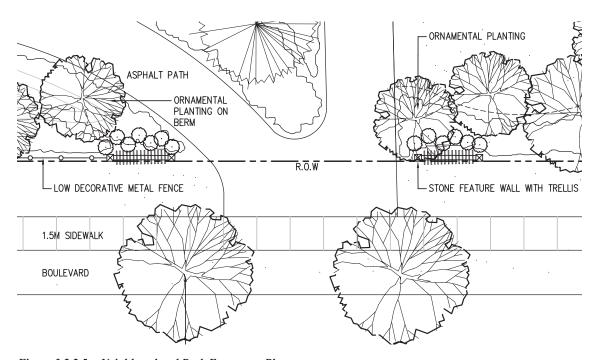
Neighbourhood Park Entrance - Plan
